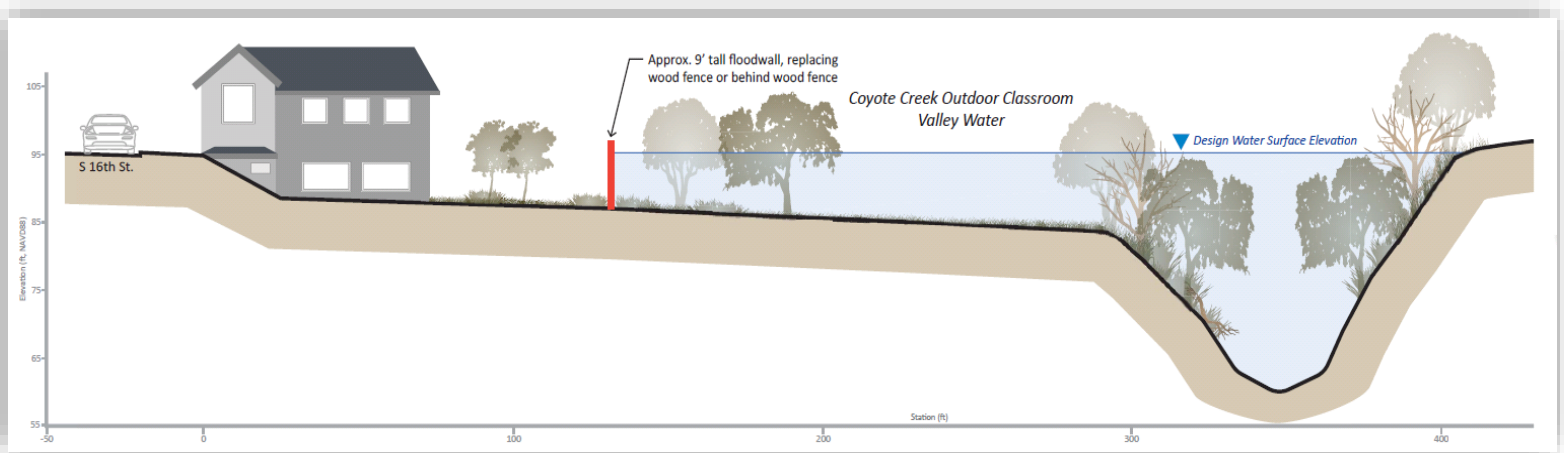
Reach 7 – Cross-section of proposed floodwall on the western edge of the Coyote Outdoor classroom per options A, B, C and D
